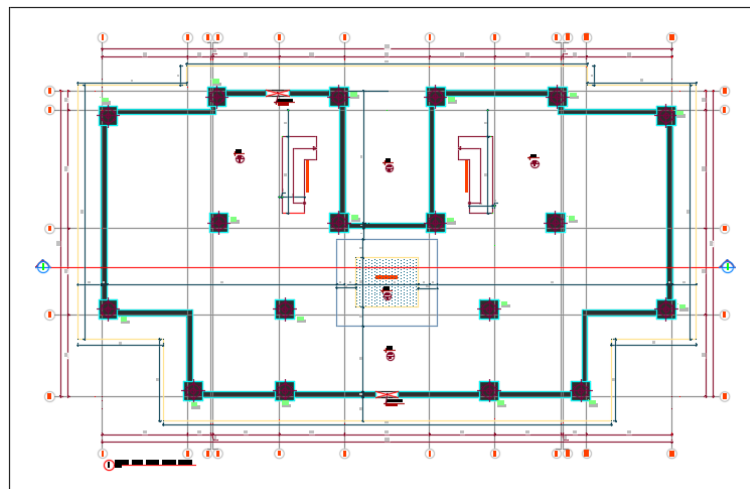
Architectural plan of the structure of Adıyaman Residential Building
